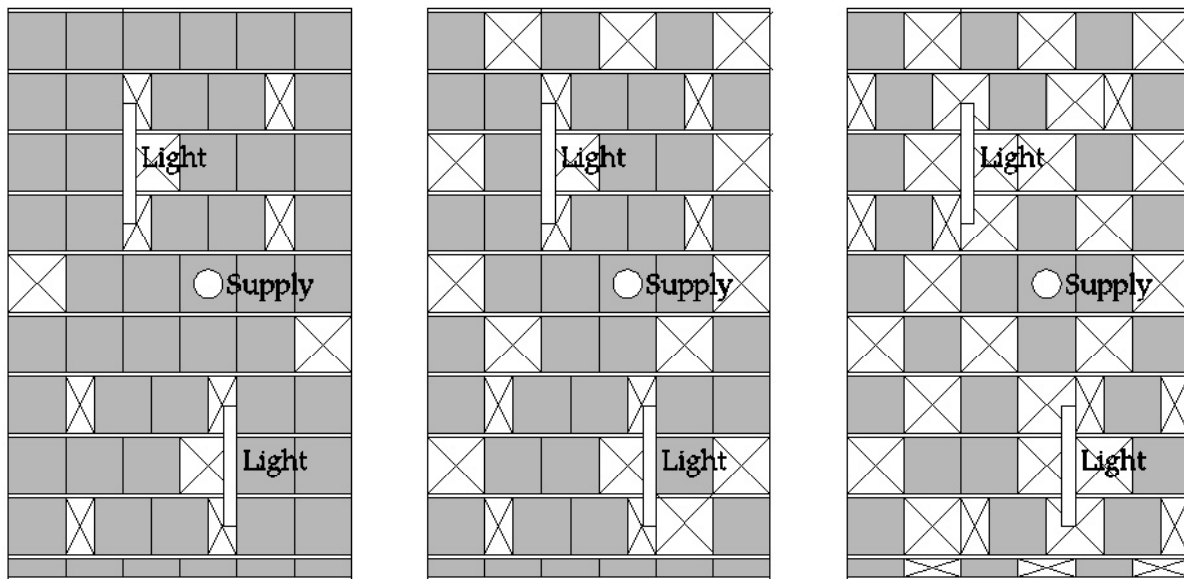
87%, 70% and 53% suspended ceiling covering layouts
